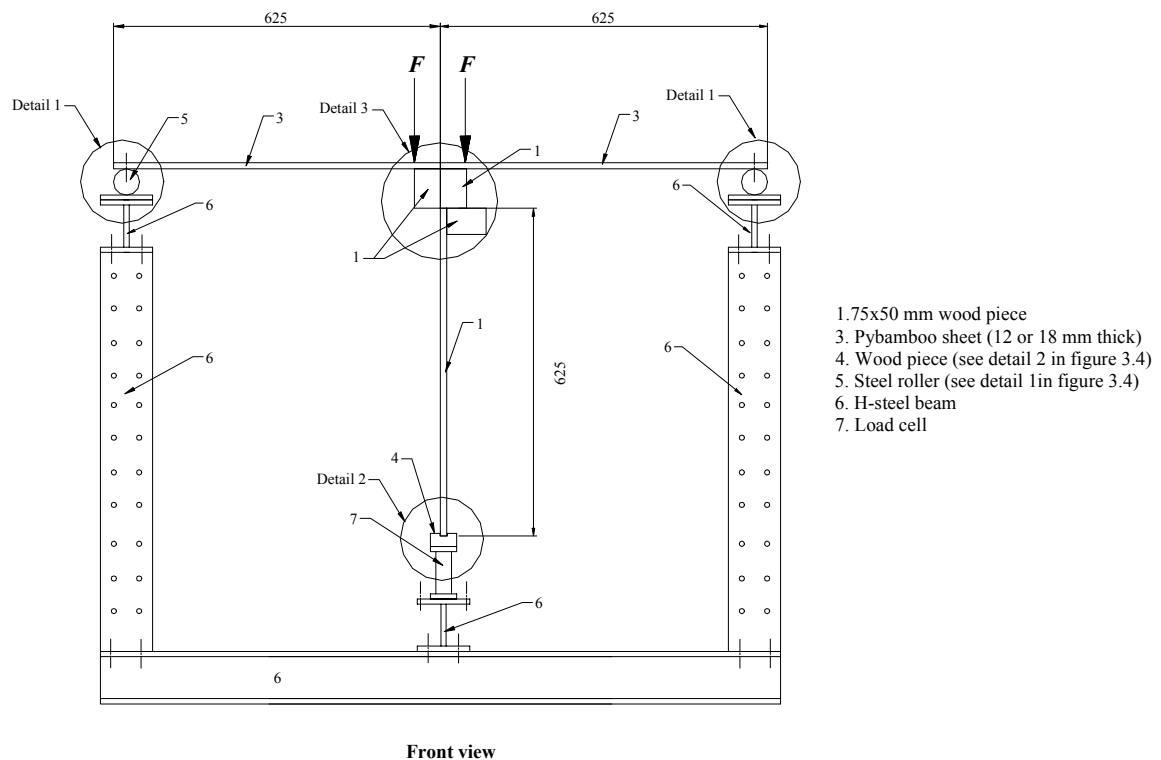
Test setup showing specimen and frame. For side view see figure 3.3.
